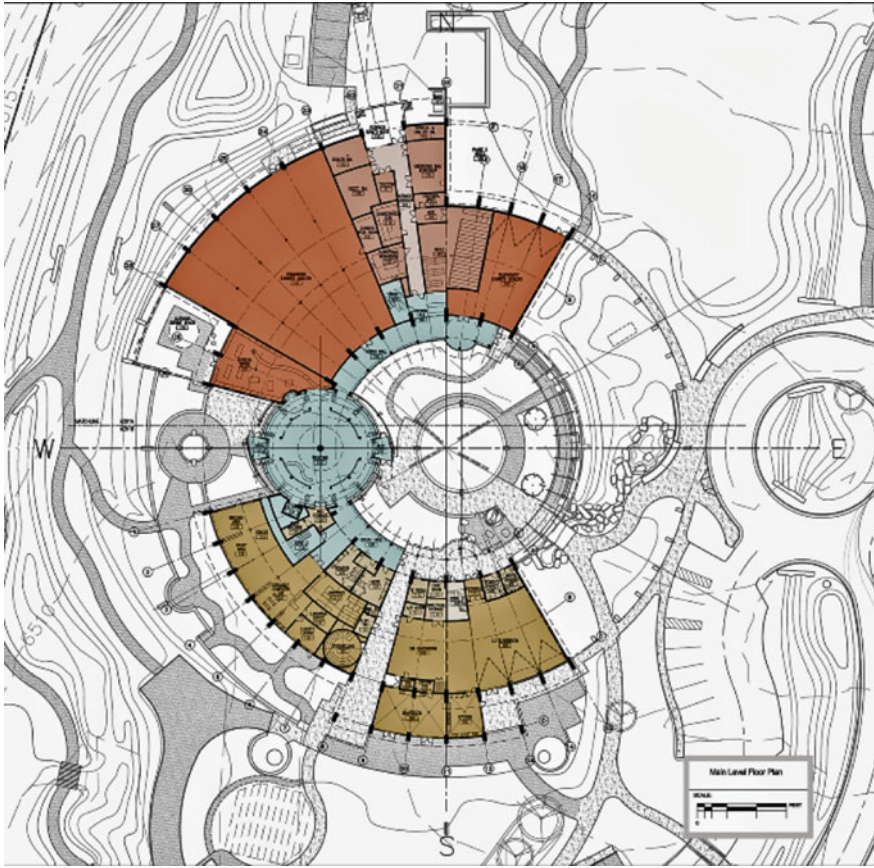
Main floor plan, Southern Ute Cultural Center and Museum (*Drawing Jones & Jones Architects + Landscape Architects + Planners*)
